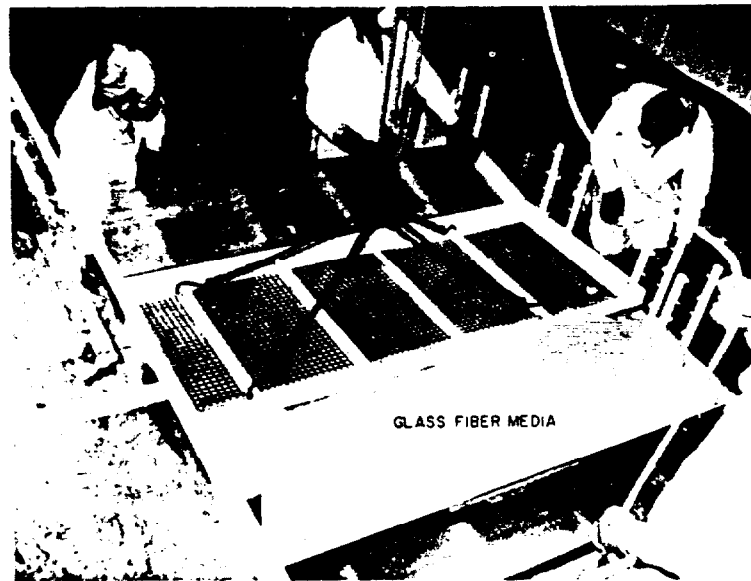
Installing top screen on fiber-backed tray of a 291-A-2 DBGF filter under construction at the Purex plant. Courtesy Atlantic Richfield Hanford Co.
